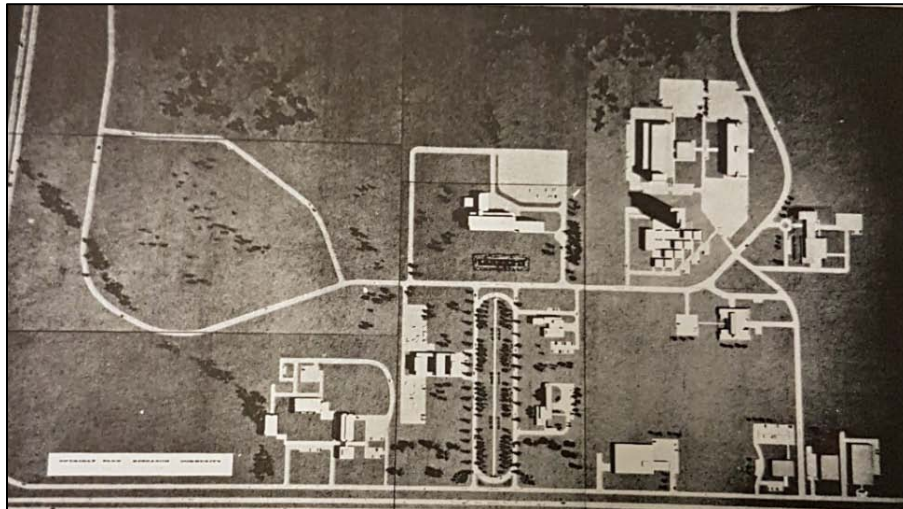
Model plan of Sheridan Park (Ontario Archives RG32-23)
